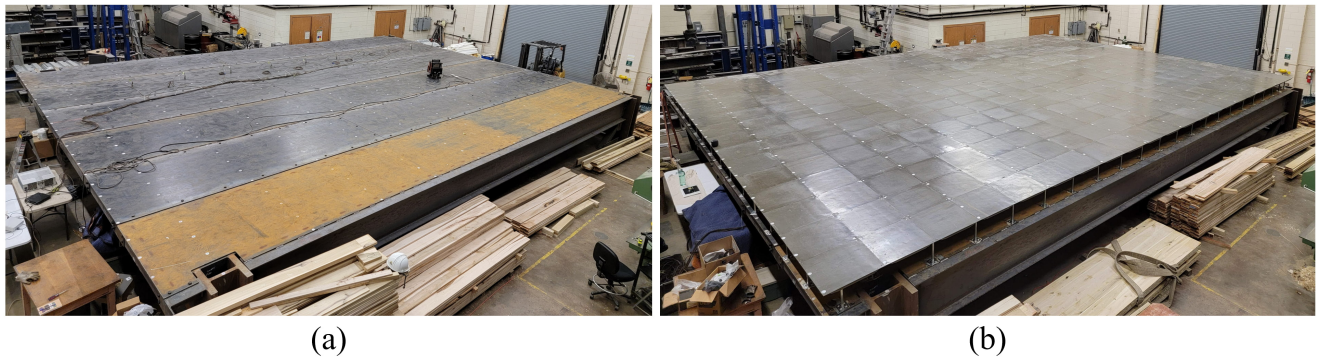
The full-bay FastFloor specimen: (a) bare steel deck condition and (b) with the raised access floor (RAF) installed. The RAF configuration represents the unloaded baseline for all tests
